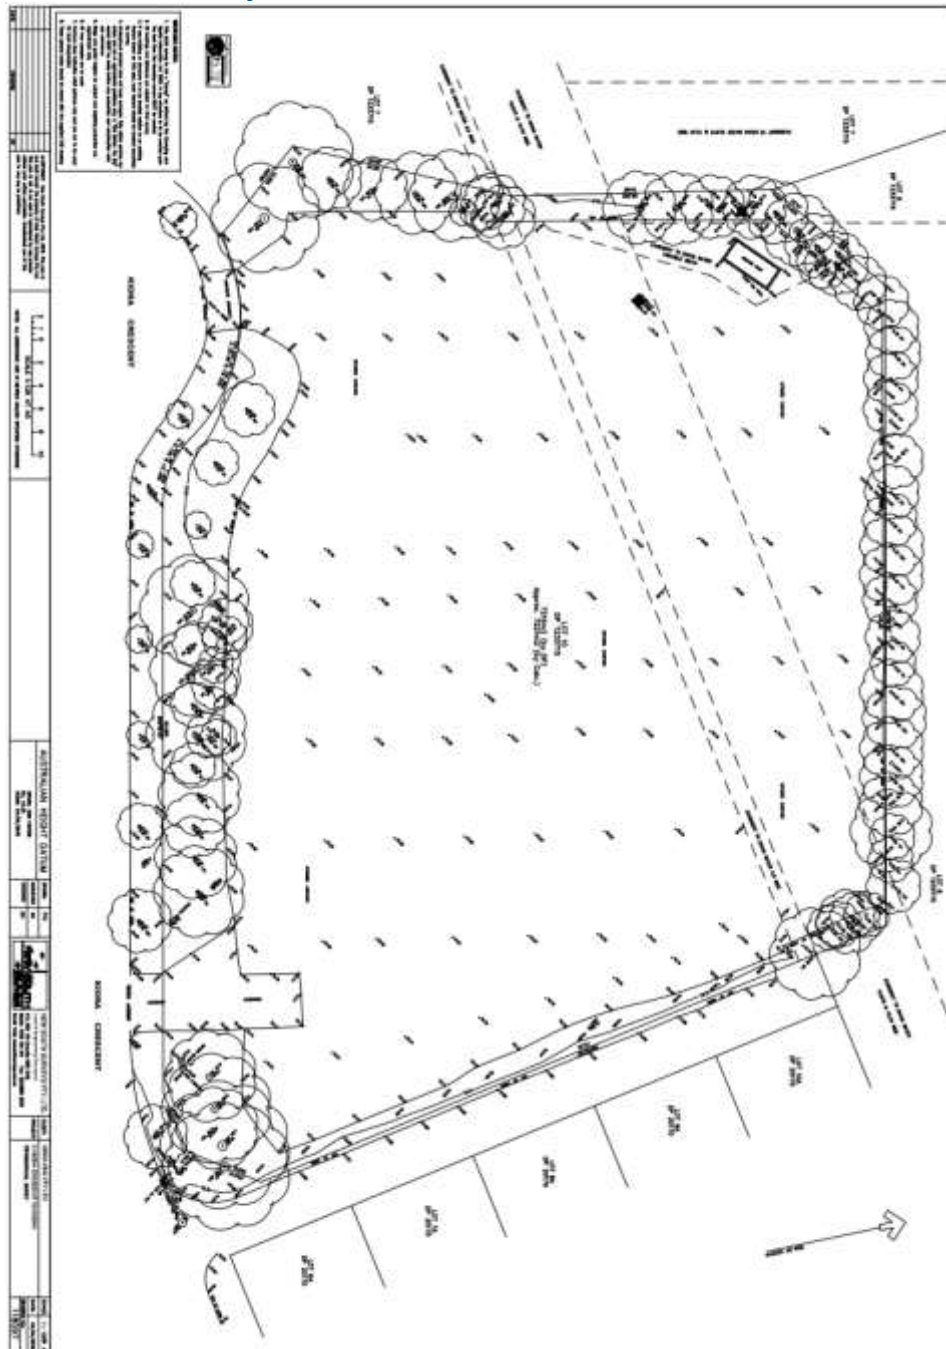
Site Survey Plan – New South Surveys, Ref:118097
